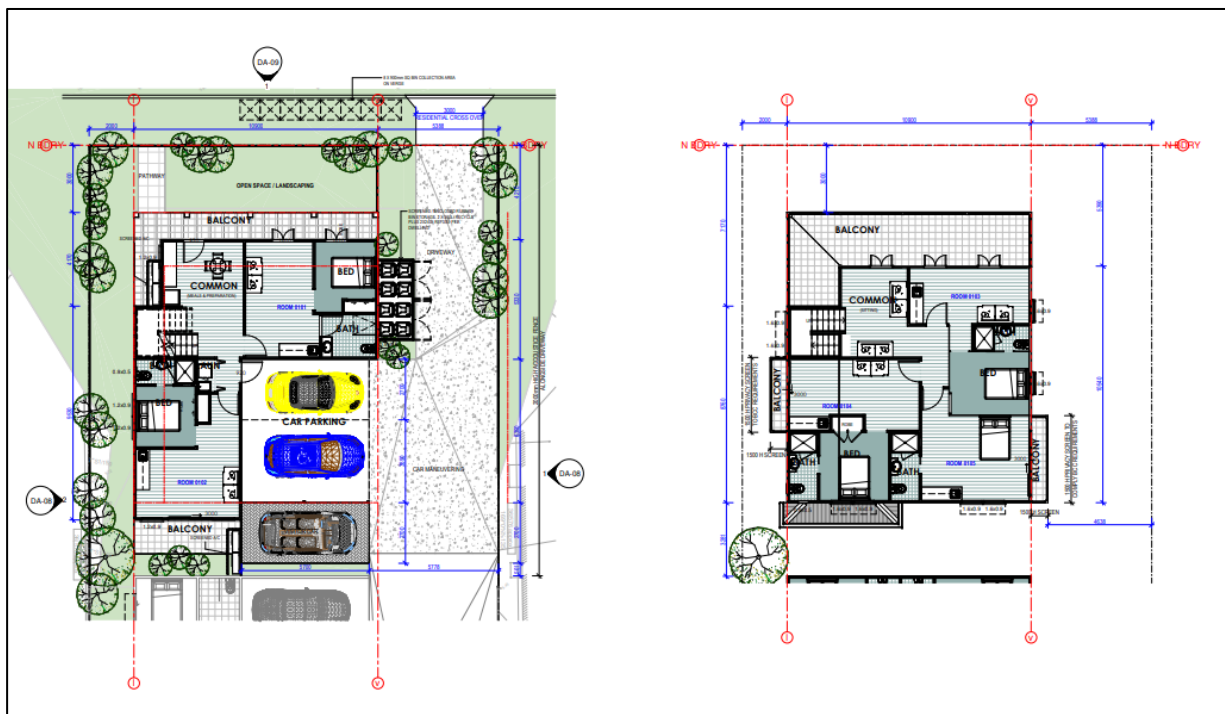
Extract of proposed site/landscape plan depicting the front dwelling
